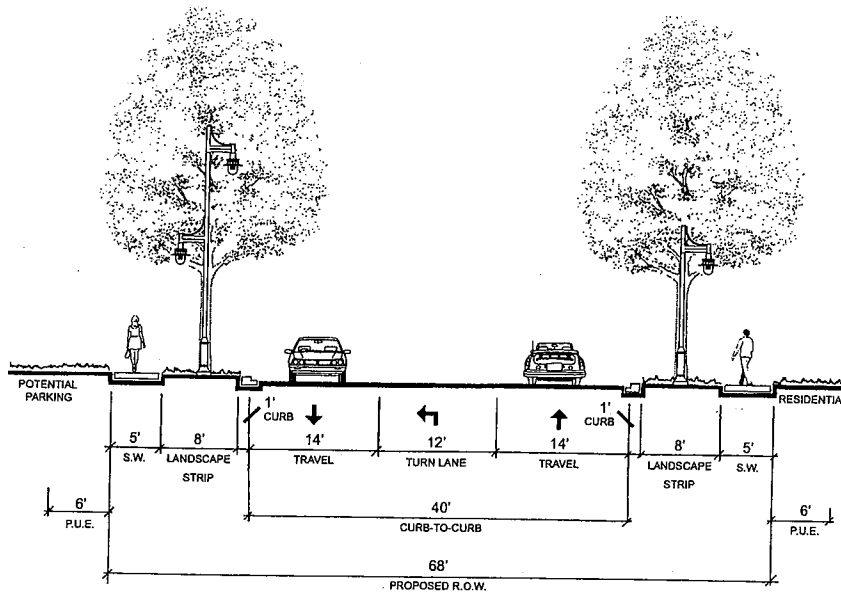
D.New.o: Harbor Way Cross Section at Intersection ⑥
